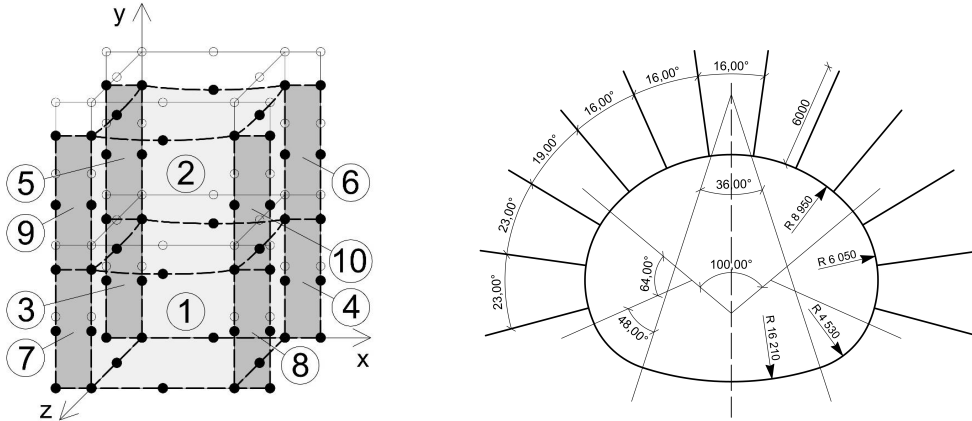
Test example consisting of two bricks and eight Aydan elements (left), and shape of excavation and spacing of rock bolts (right).
